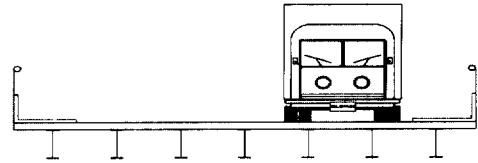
The Cross Section of Concrete Slab Steel Girder
